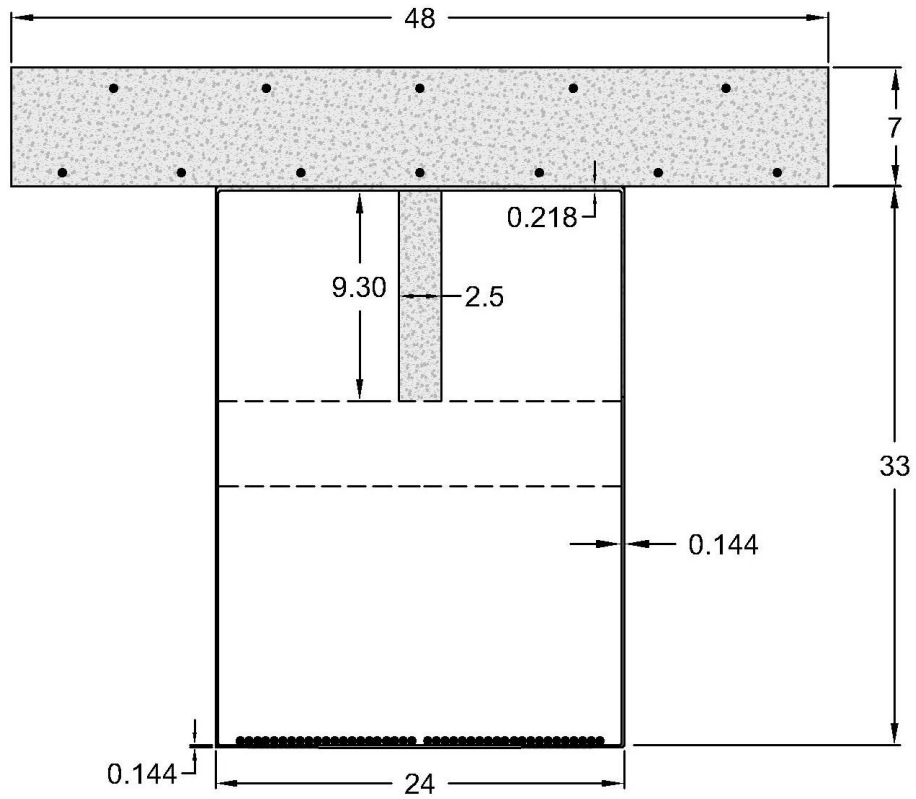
Cross section of box beam for Case C. (Dimensions in inches)
